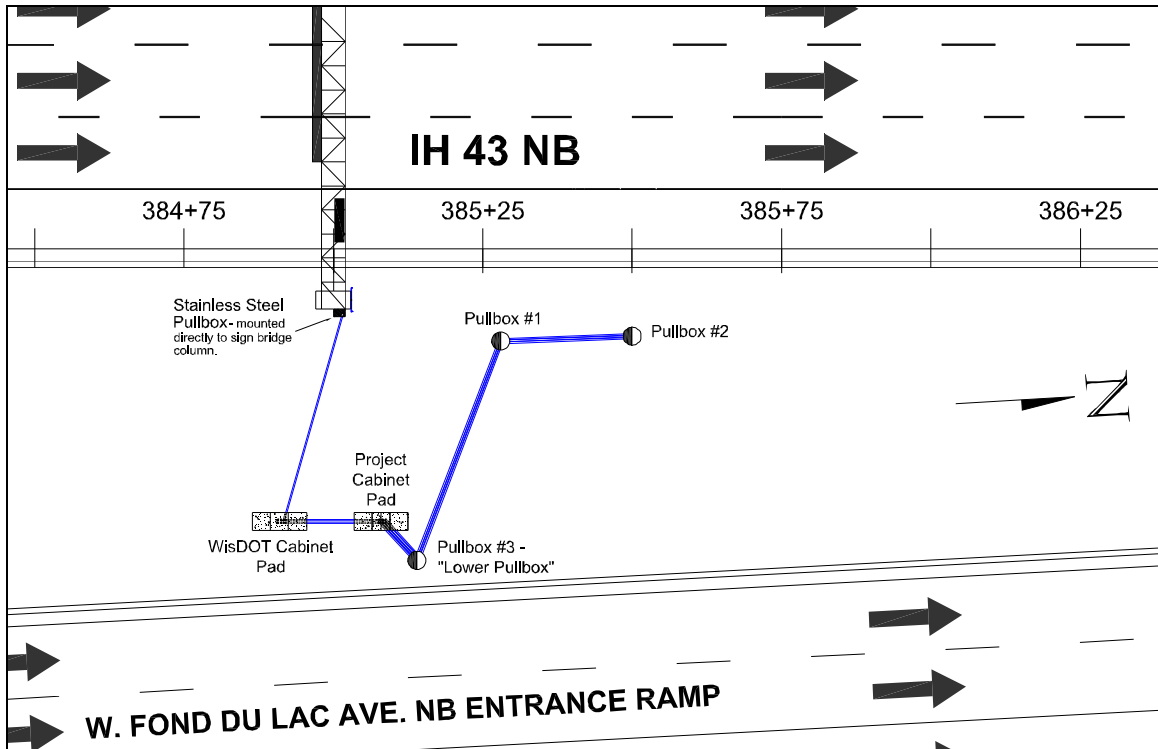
Pullbox locations and the network of conduits connecting them.
